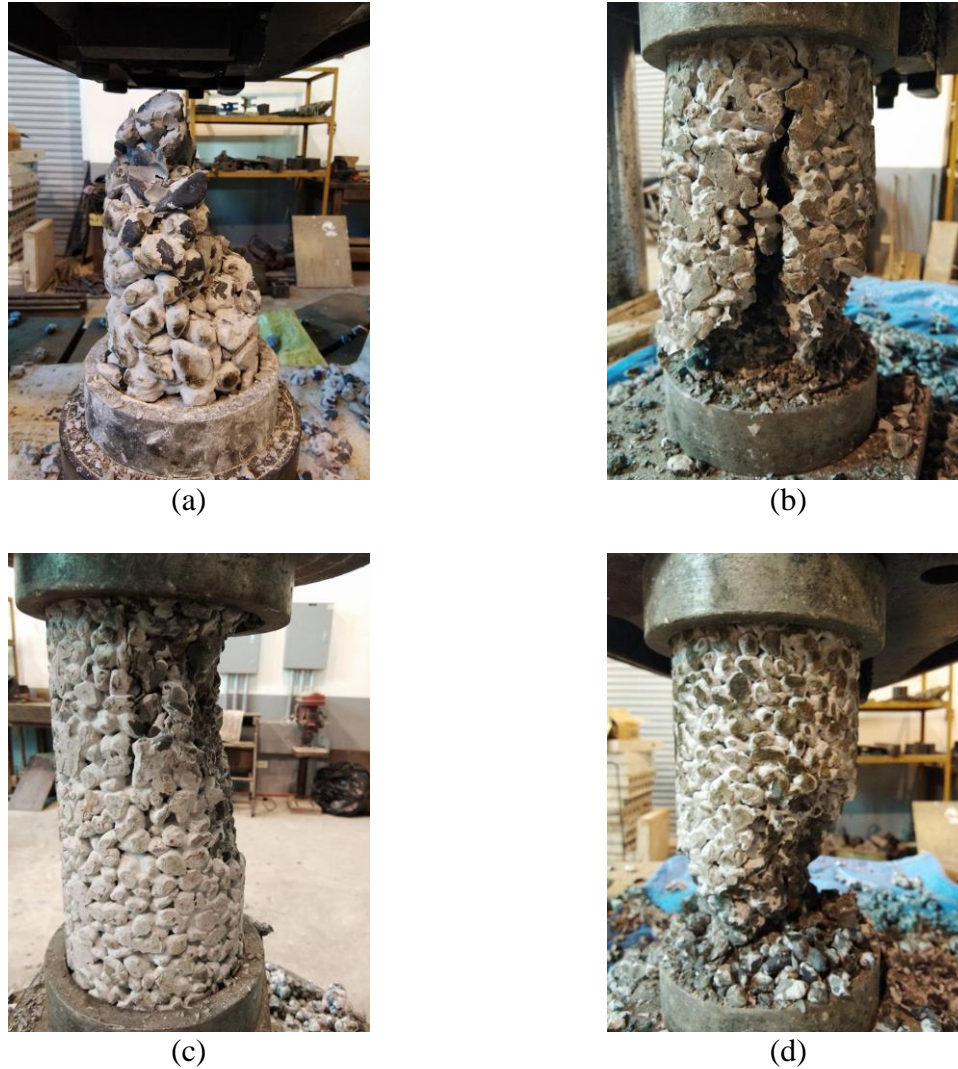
Typical Failure Patterns of Pervious Concrete: (a) Shear Failure, (b) Columnar Cracking, (c) Side Fracture on one side, (d) Side Fracture on bottom forming a cone
